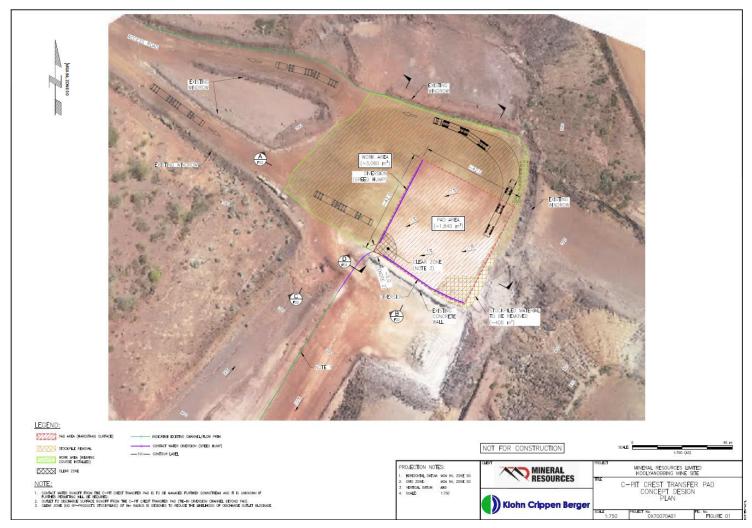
C Pit Crest Transfer Pad layout conceptual design plan
